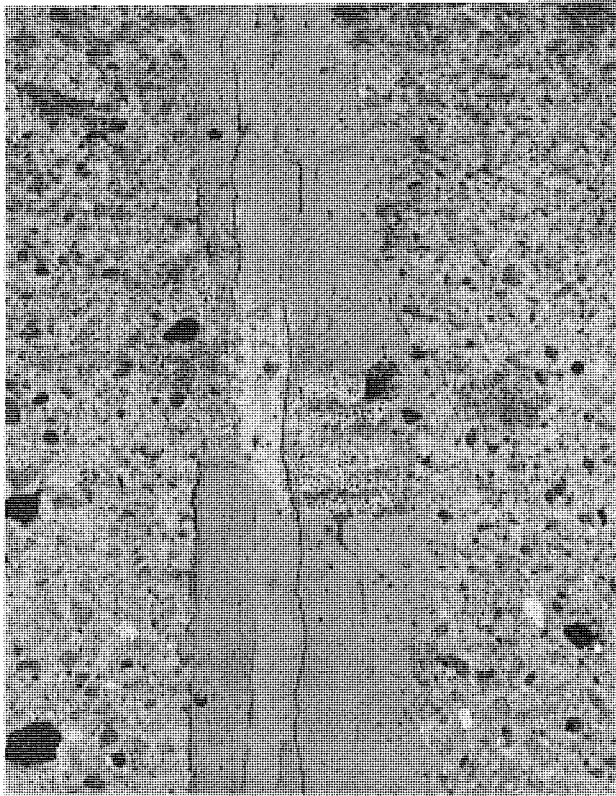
Bond failure between epoxy grouted groove and concrete surface.
